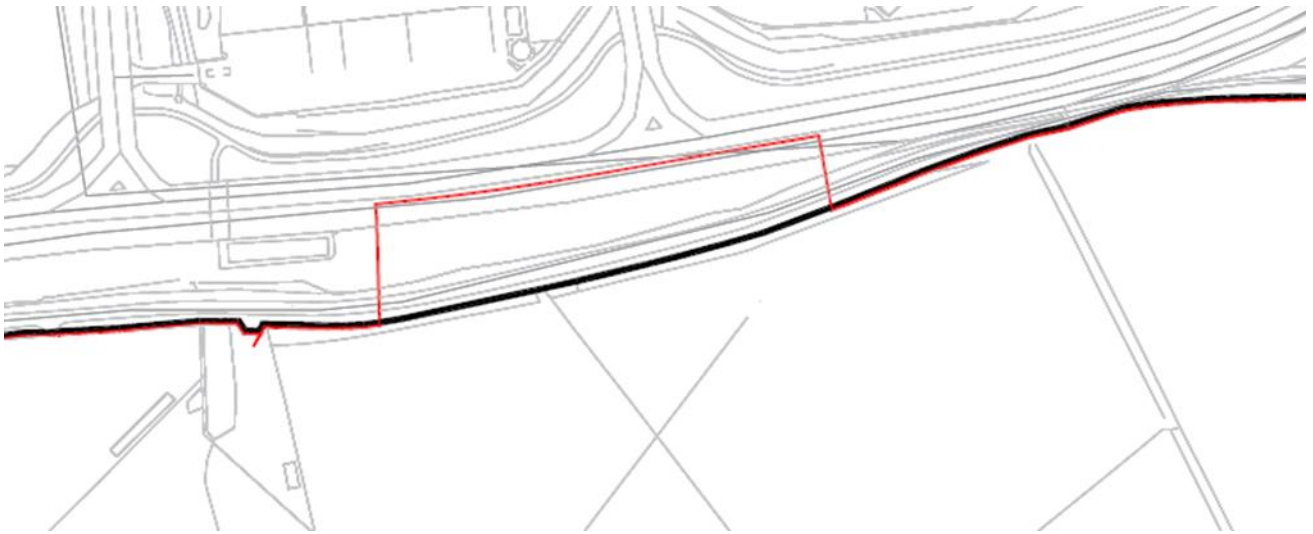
A421 Westbound point of access (left-in only) (MKC point of access)
